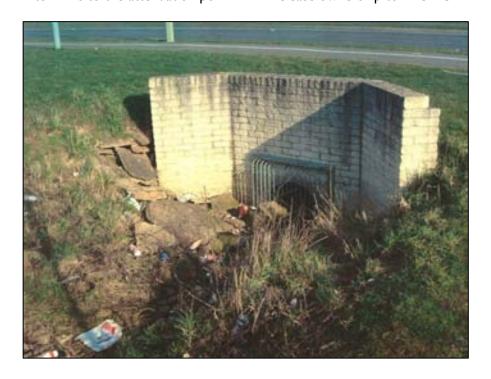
Carterton Road to RAF Brize Norton (Area 3)
